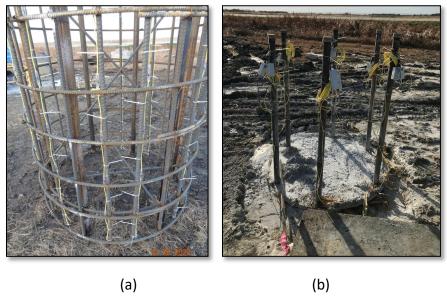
Photo. Photographs showing (a) 5 ft diameter rebar cage with 6 CSL tubes and 12 TIP thermal wires installed before placement in the shaft and (b) installed rebar cage after concrete pouring and connection of TIP readout boxes.
